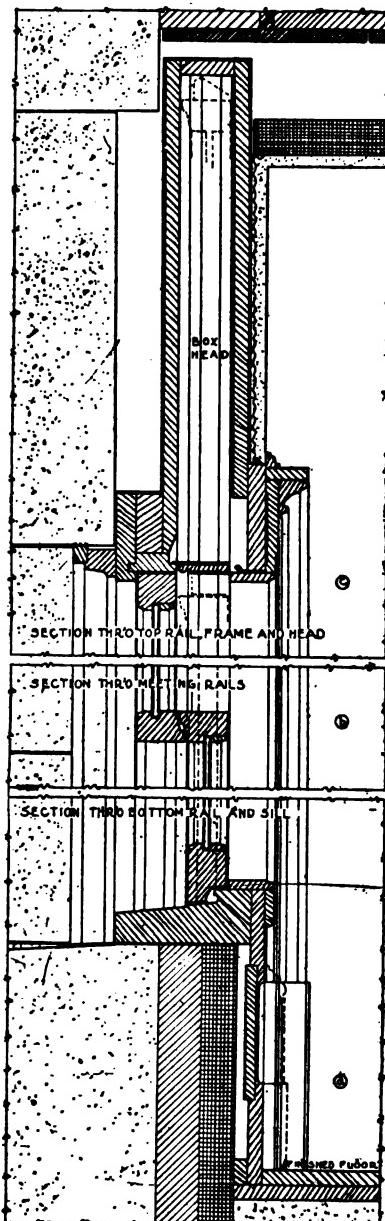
Window-Frame with Double-Hung Sash and Box Head. University Club Building, New York City.
